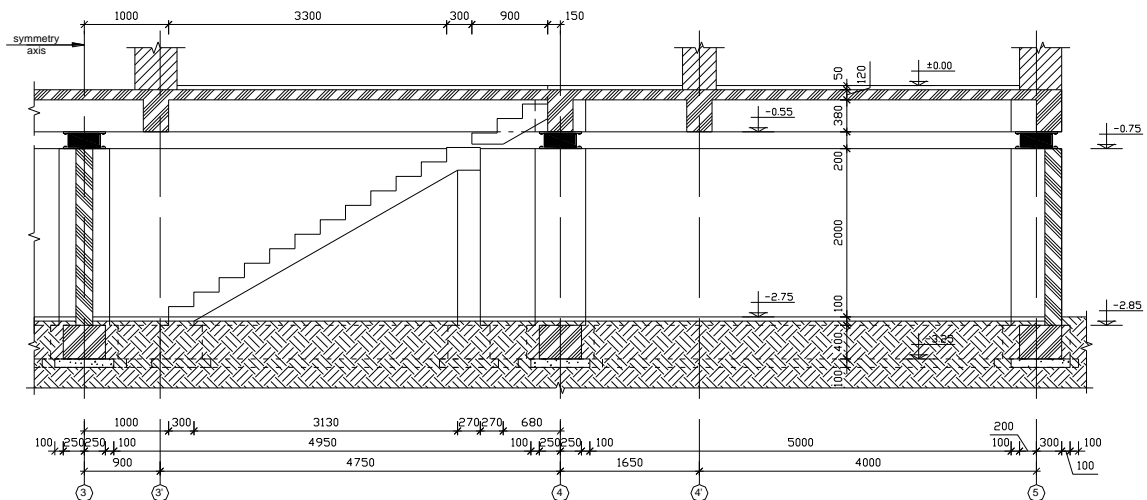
Vertical elevation 1-1 of the basement/parking floor of four residential houses showing the seismic isolation system, the main gap around the perimeter of the basement/parking floor and the gap in the single-flight stairs
